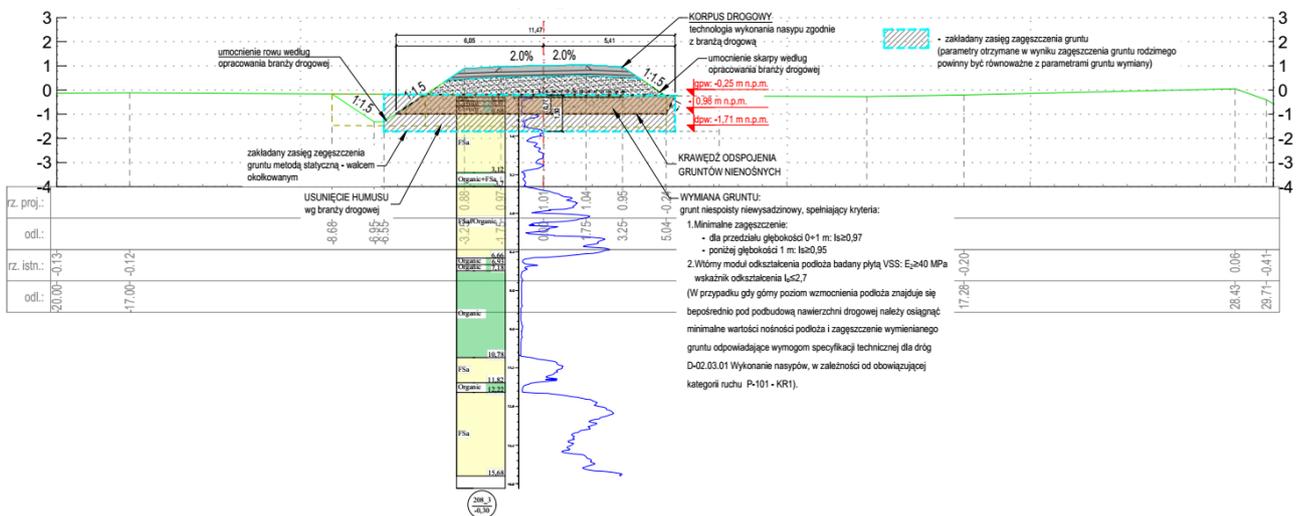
Cross-section of surface ground improvement in km 0+340 of access road P-101
